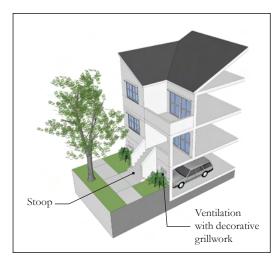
Semi-depressed parking should be screened with architectural elements that enhance the streetscape such as stoops, porches, or balcony overhangs.
